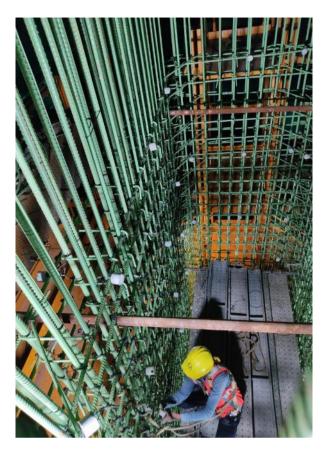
MP 118 S 2nd Lift Pier Reinforcement in progress
